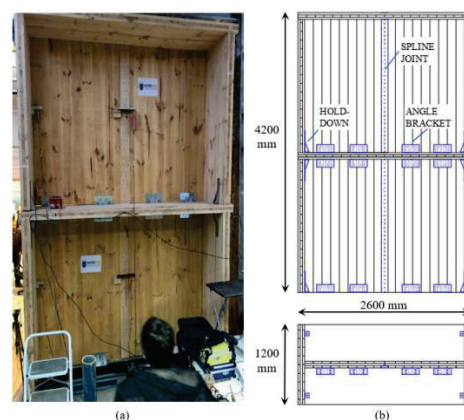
(a) Laboratory assembly, (b) Dimensions and joints.
